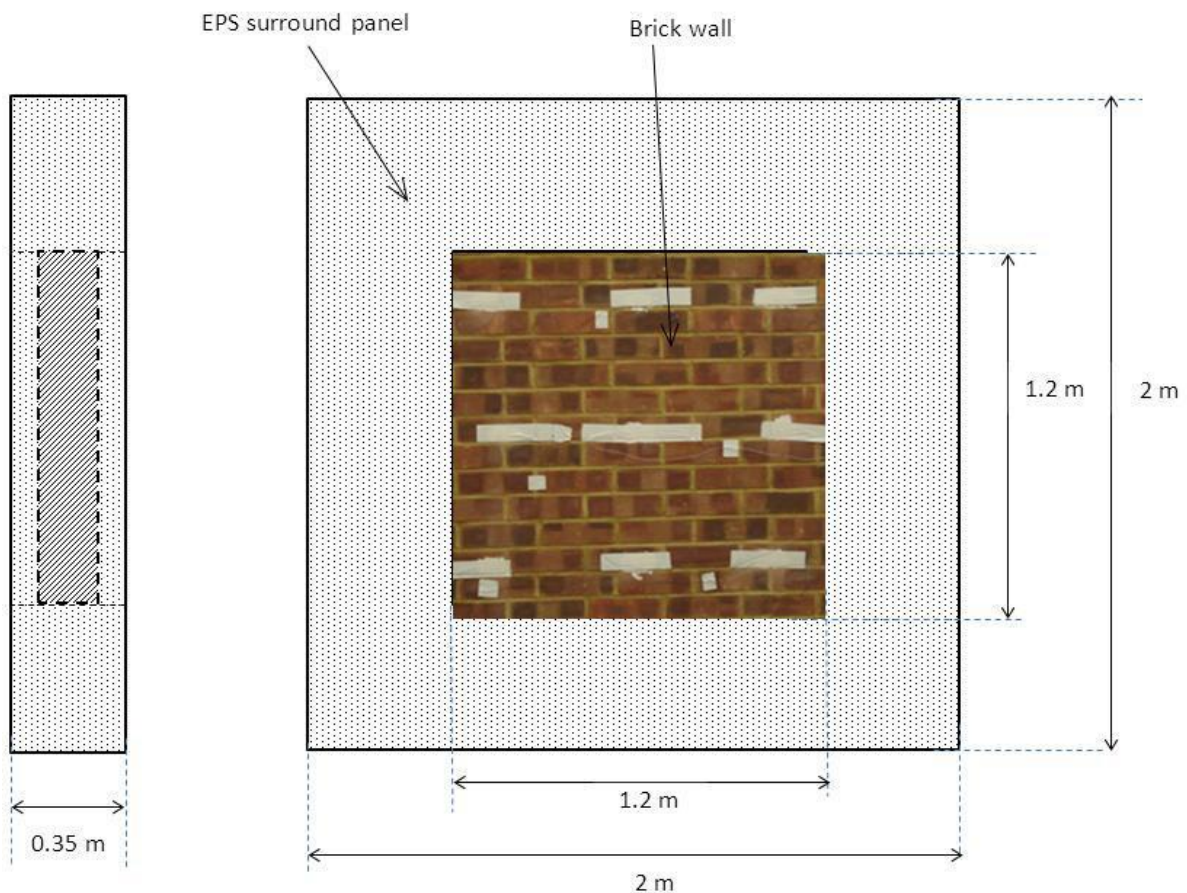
A wall and EPS surround assemblage used within the hot-box apparatus.
